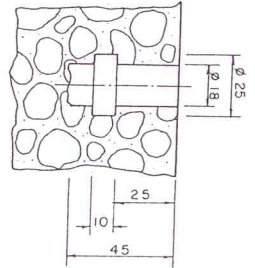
Hole and groove drilled out for the so-called CAPO-TEST pullout system. (Dimensions in mm).
